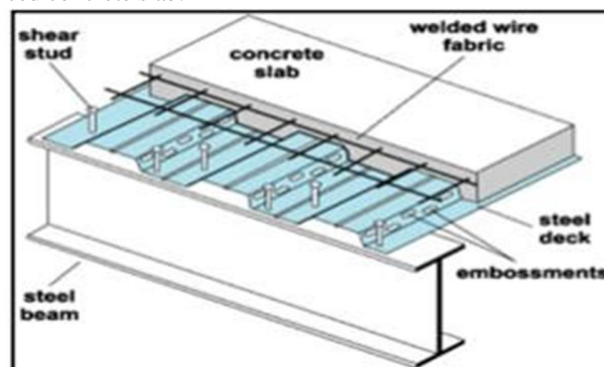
Typical composite beam-slab (S Mahesh et.al., 2014)
